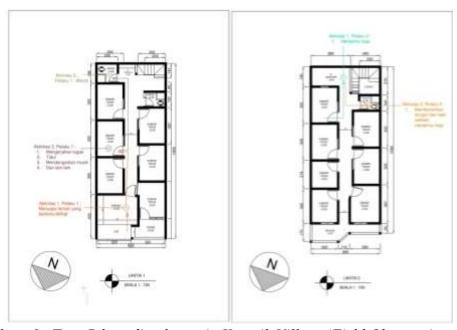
Plan of a Type B boarding house in Keputih Village (Field Observation, 2022)
